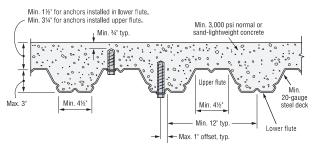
Installation of %"- and ½"-Diameter Anchors in the Soffit of Concrete over Steel Deck
